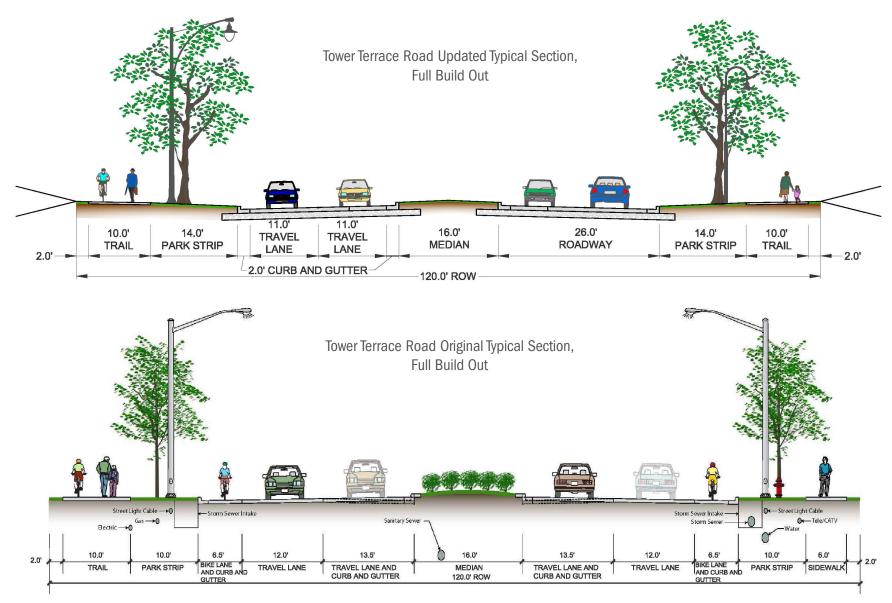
Tower Terrace Road Updated (top) and Original (bottom) Typical Sections for the Full Build Out
